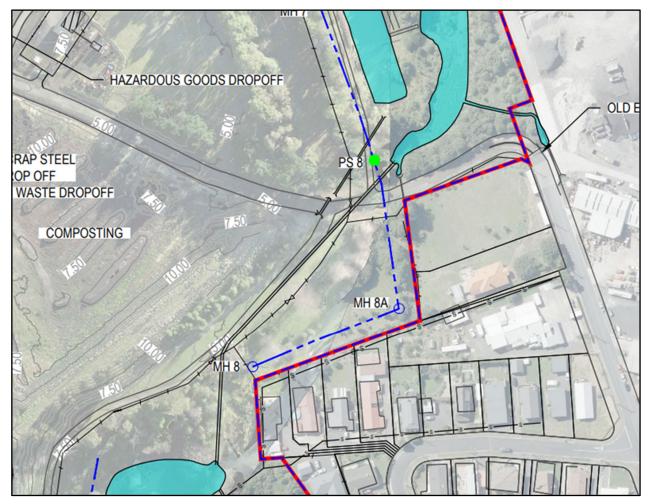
SE Constructed Wetland Culvert and Leachate Interception Trench Alignment (snip from Drawing C204)
